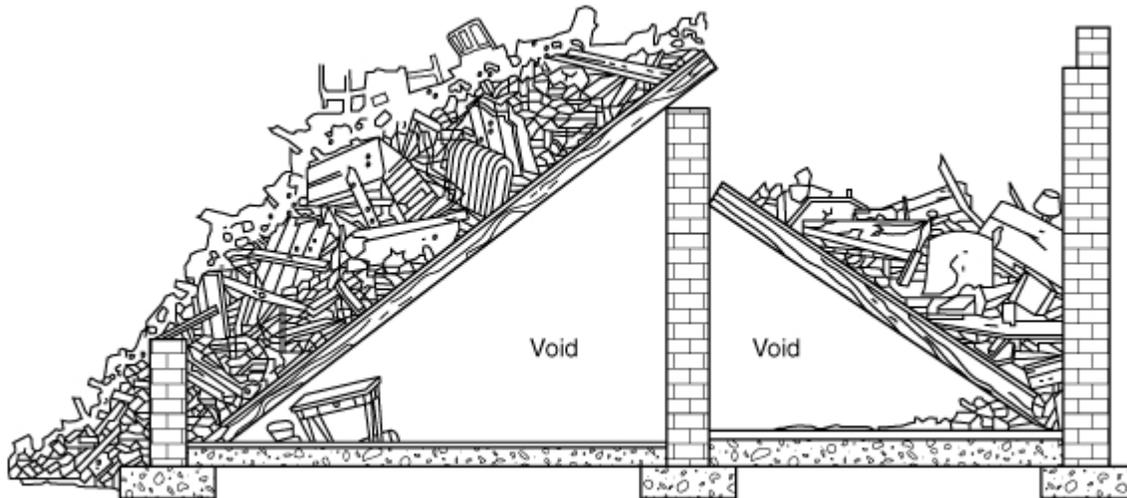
(6)(e) A-Frame Floor Collapse.
